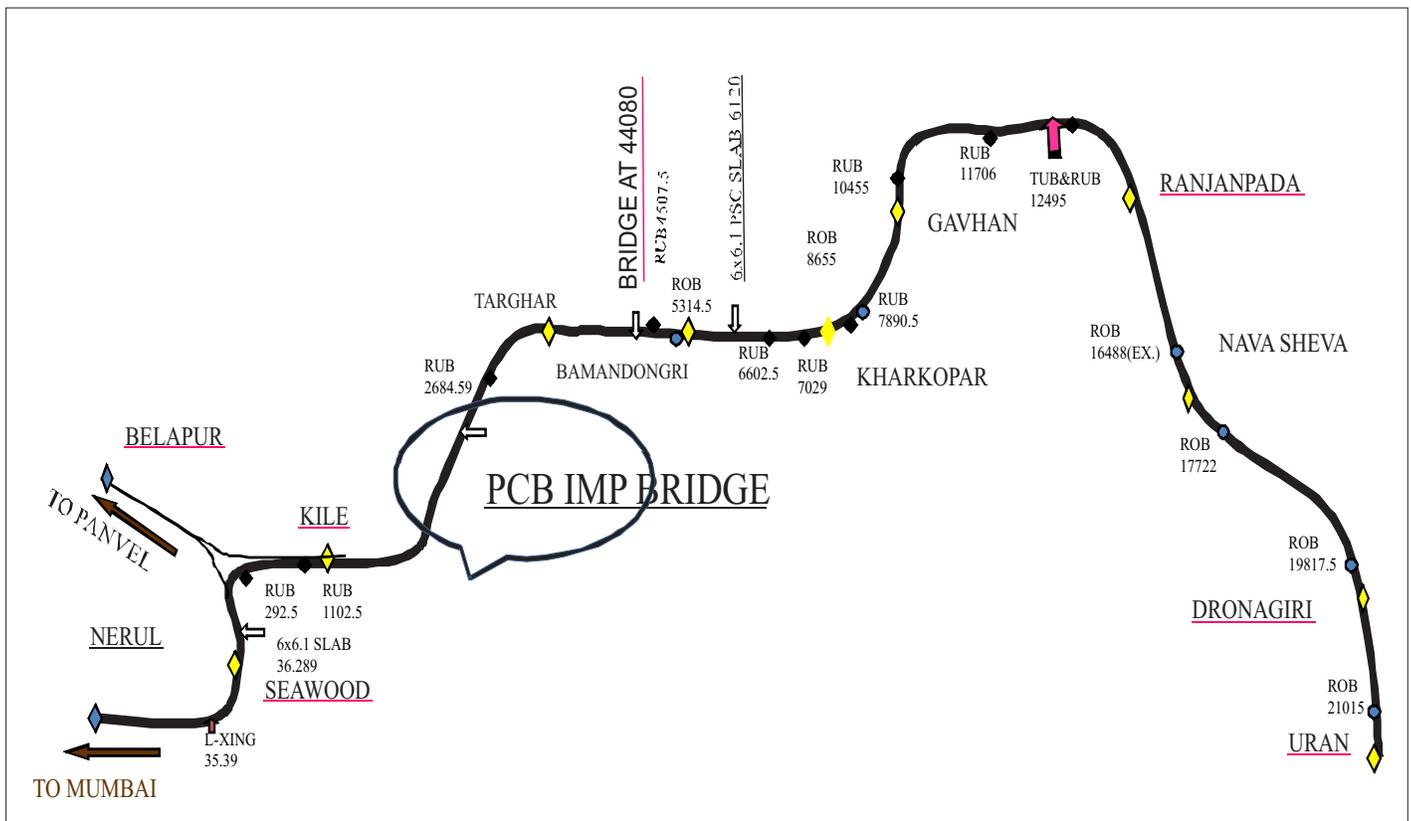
Index plan of Belapur – Seawood – Uran section
